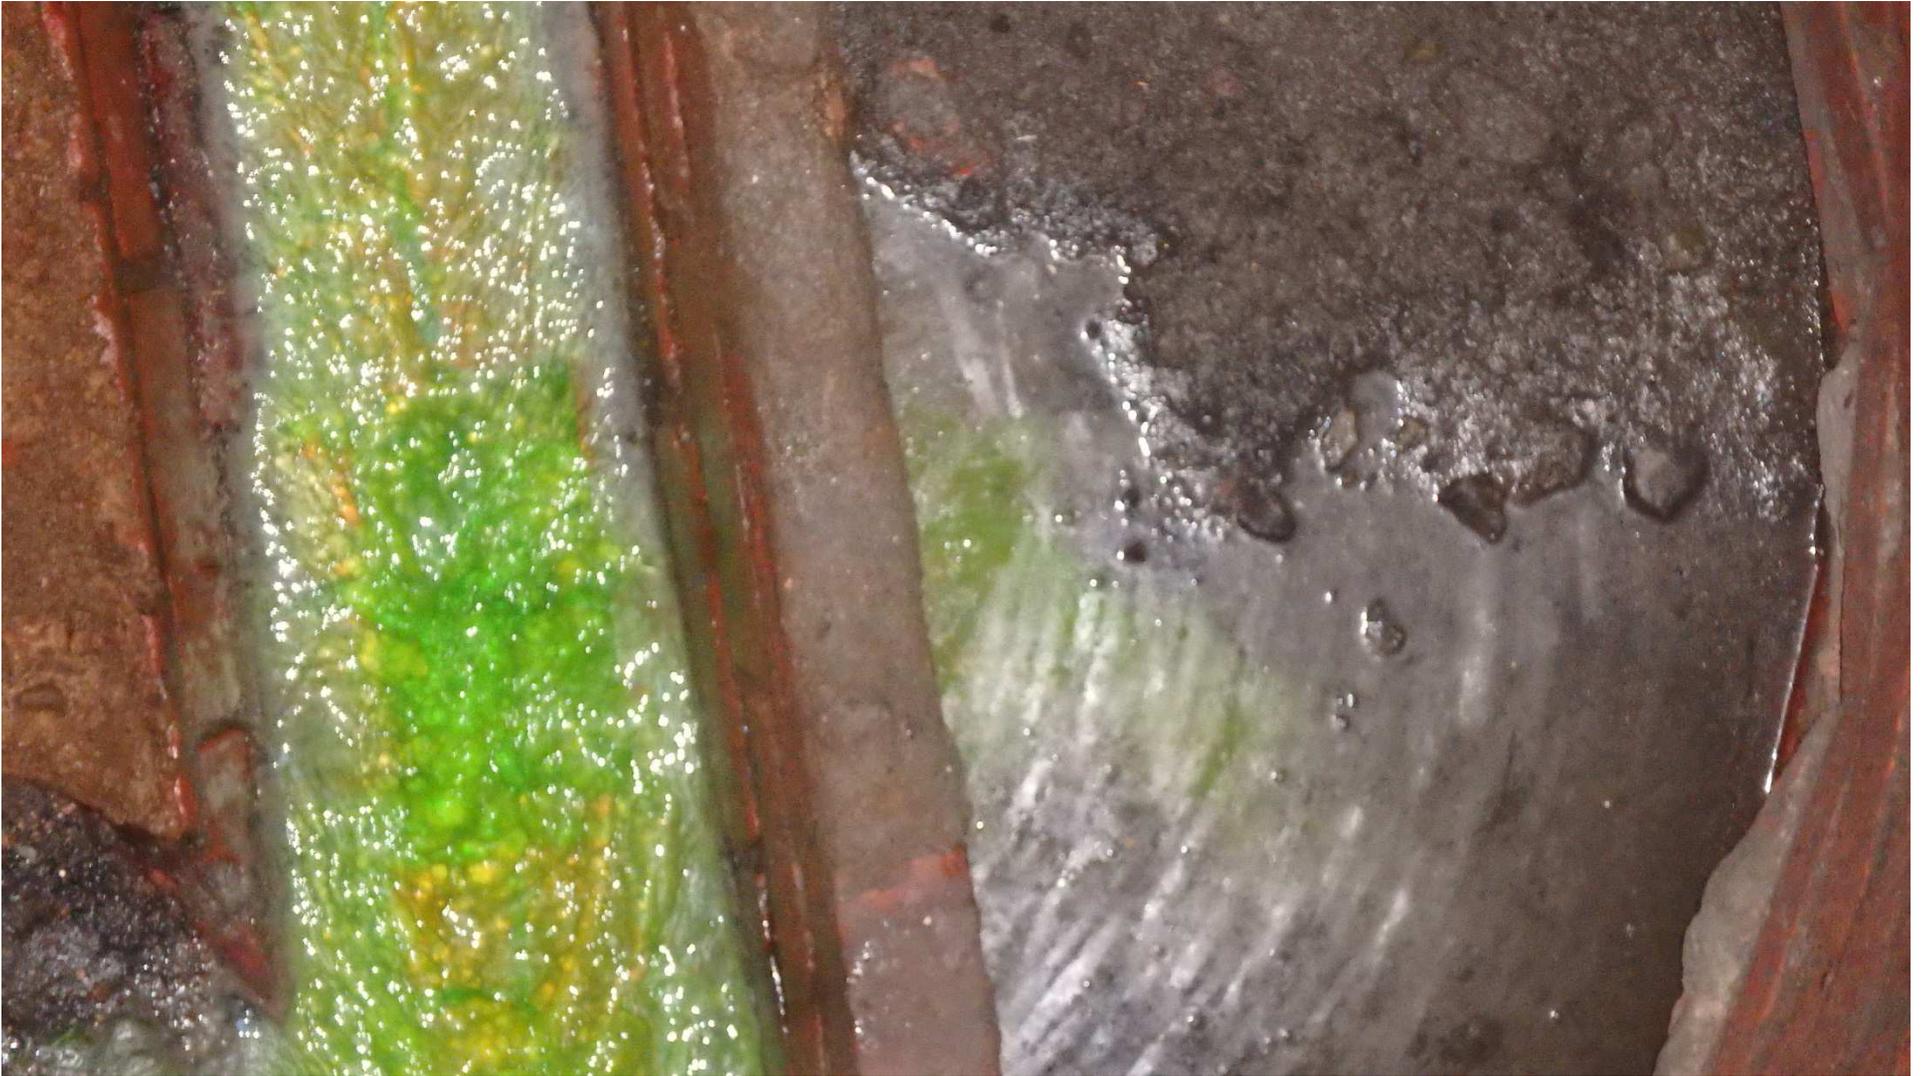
Dye from LA Market in sewer manhole A-336 underdrain cavern
